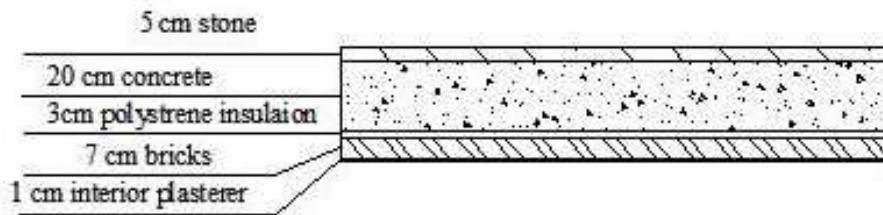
Cross-sections in outer wall for class 13.[12]
